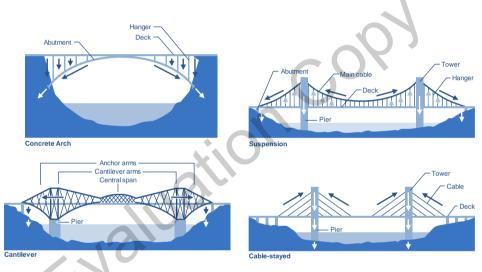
Schematic drawings of different suspension bridge concepts.
